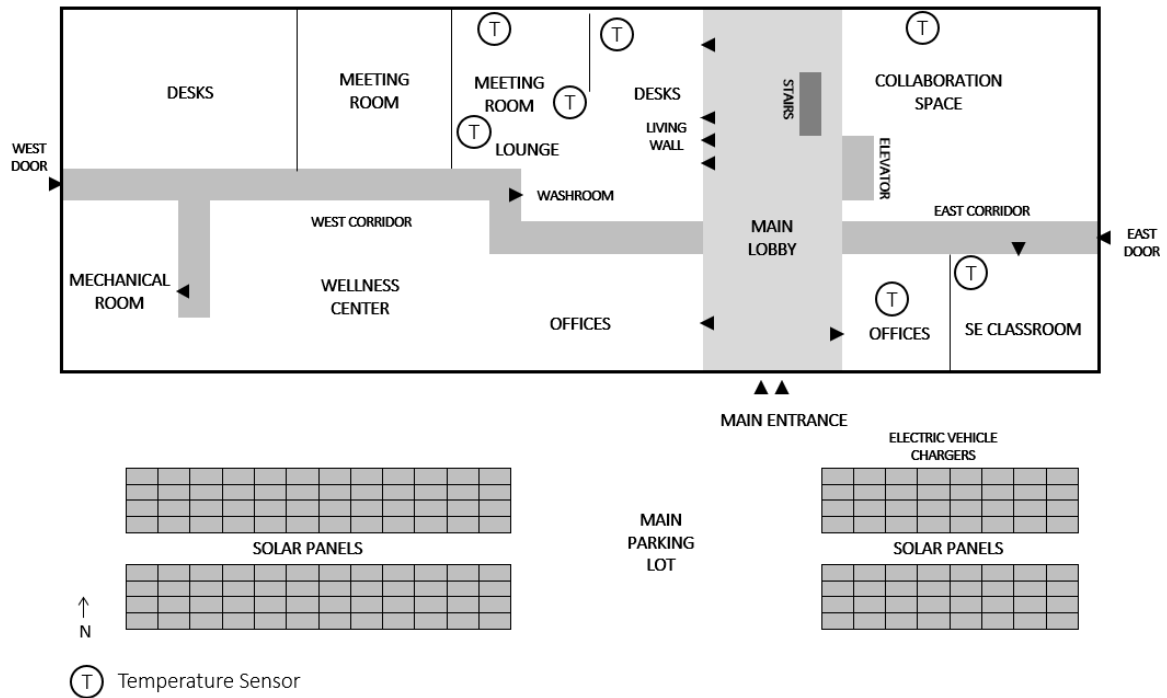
First floor plan of the case study building providing an orientation of where temperature sensors are located
